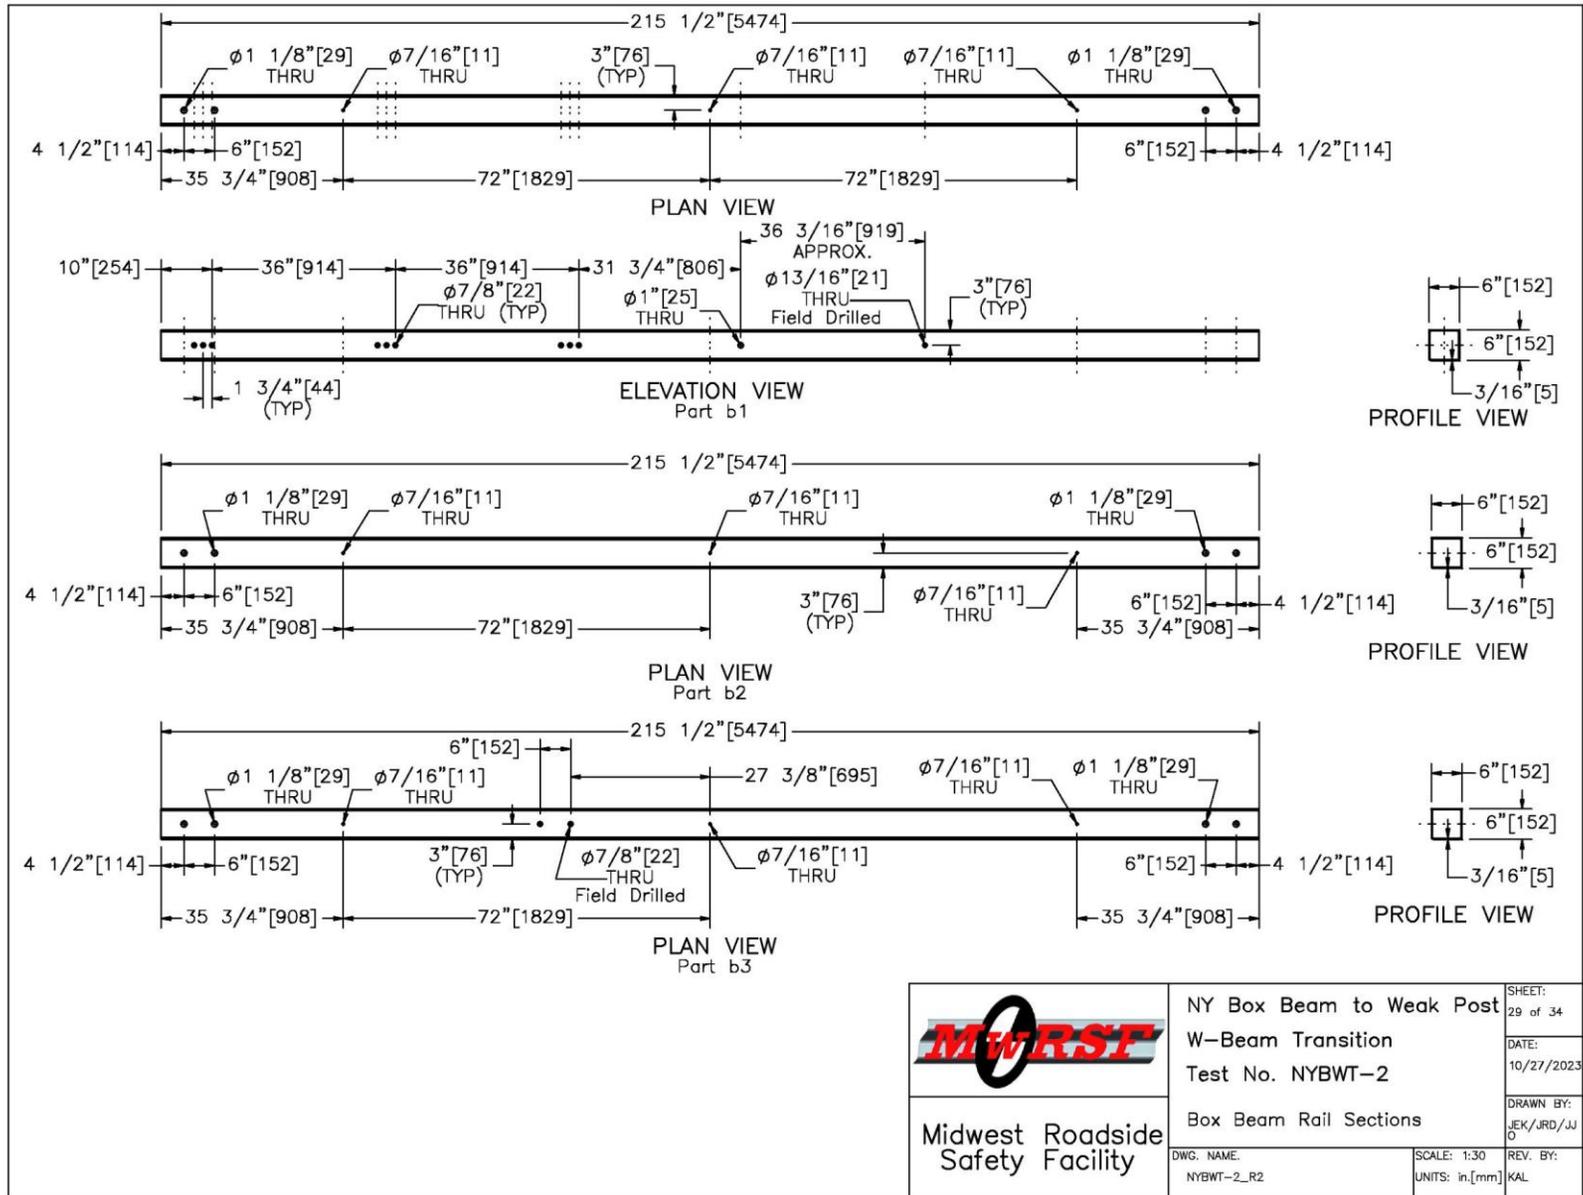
Box Beam Rail Section, Test No. NYBWT-2
